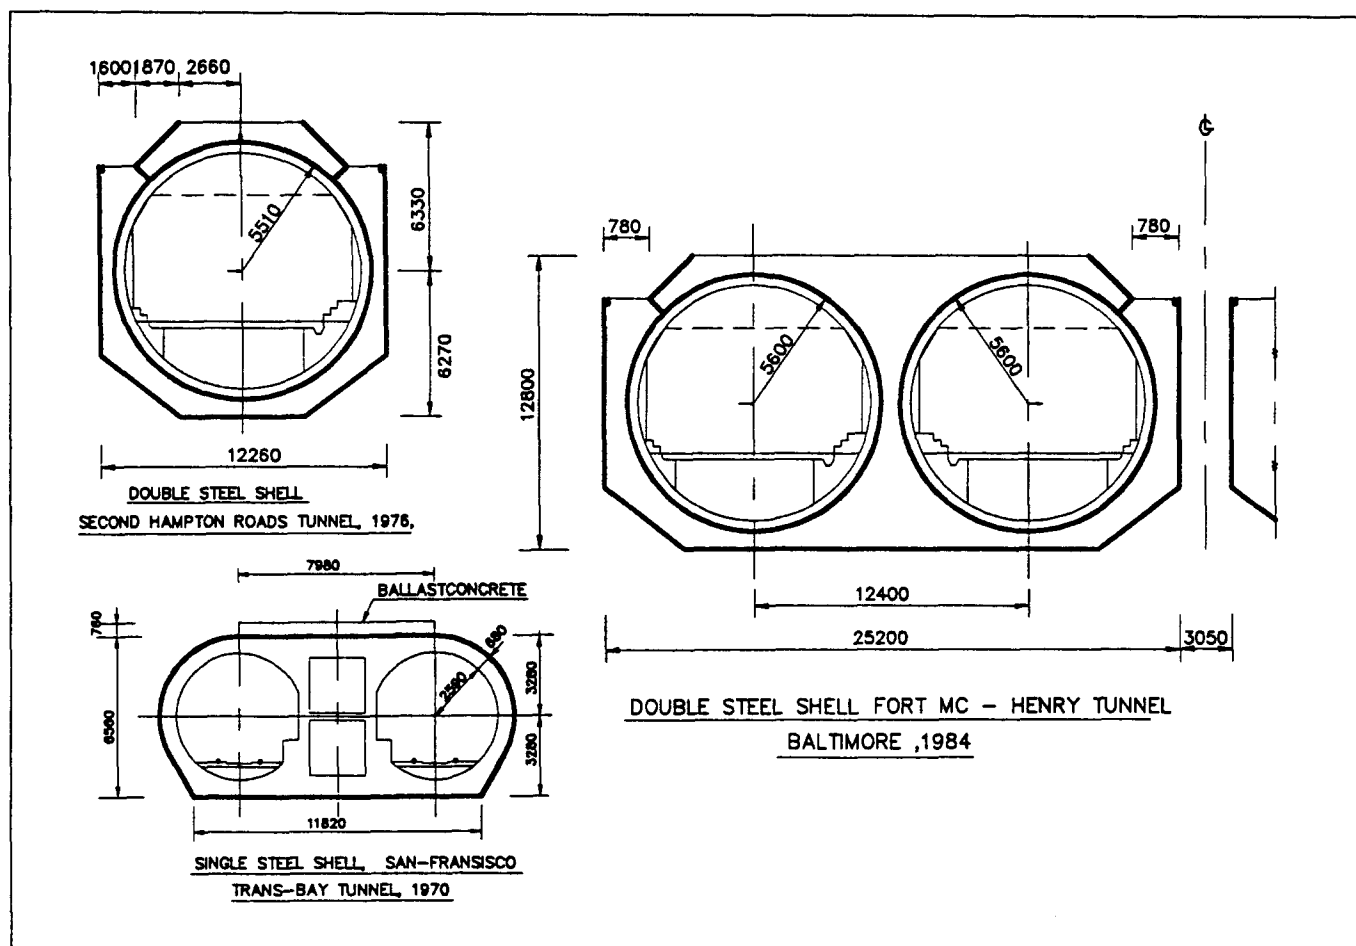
Examples of cross-sections of steel-shell tunnels.
